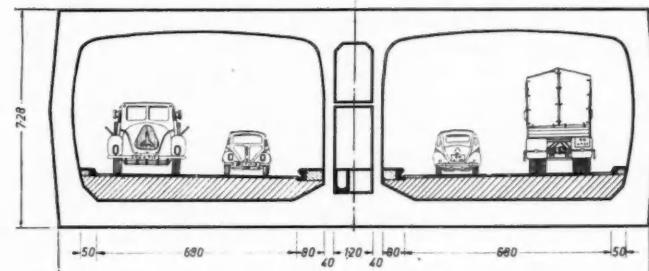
Section through 140 m. long central prefabricated portion of tunnel.
